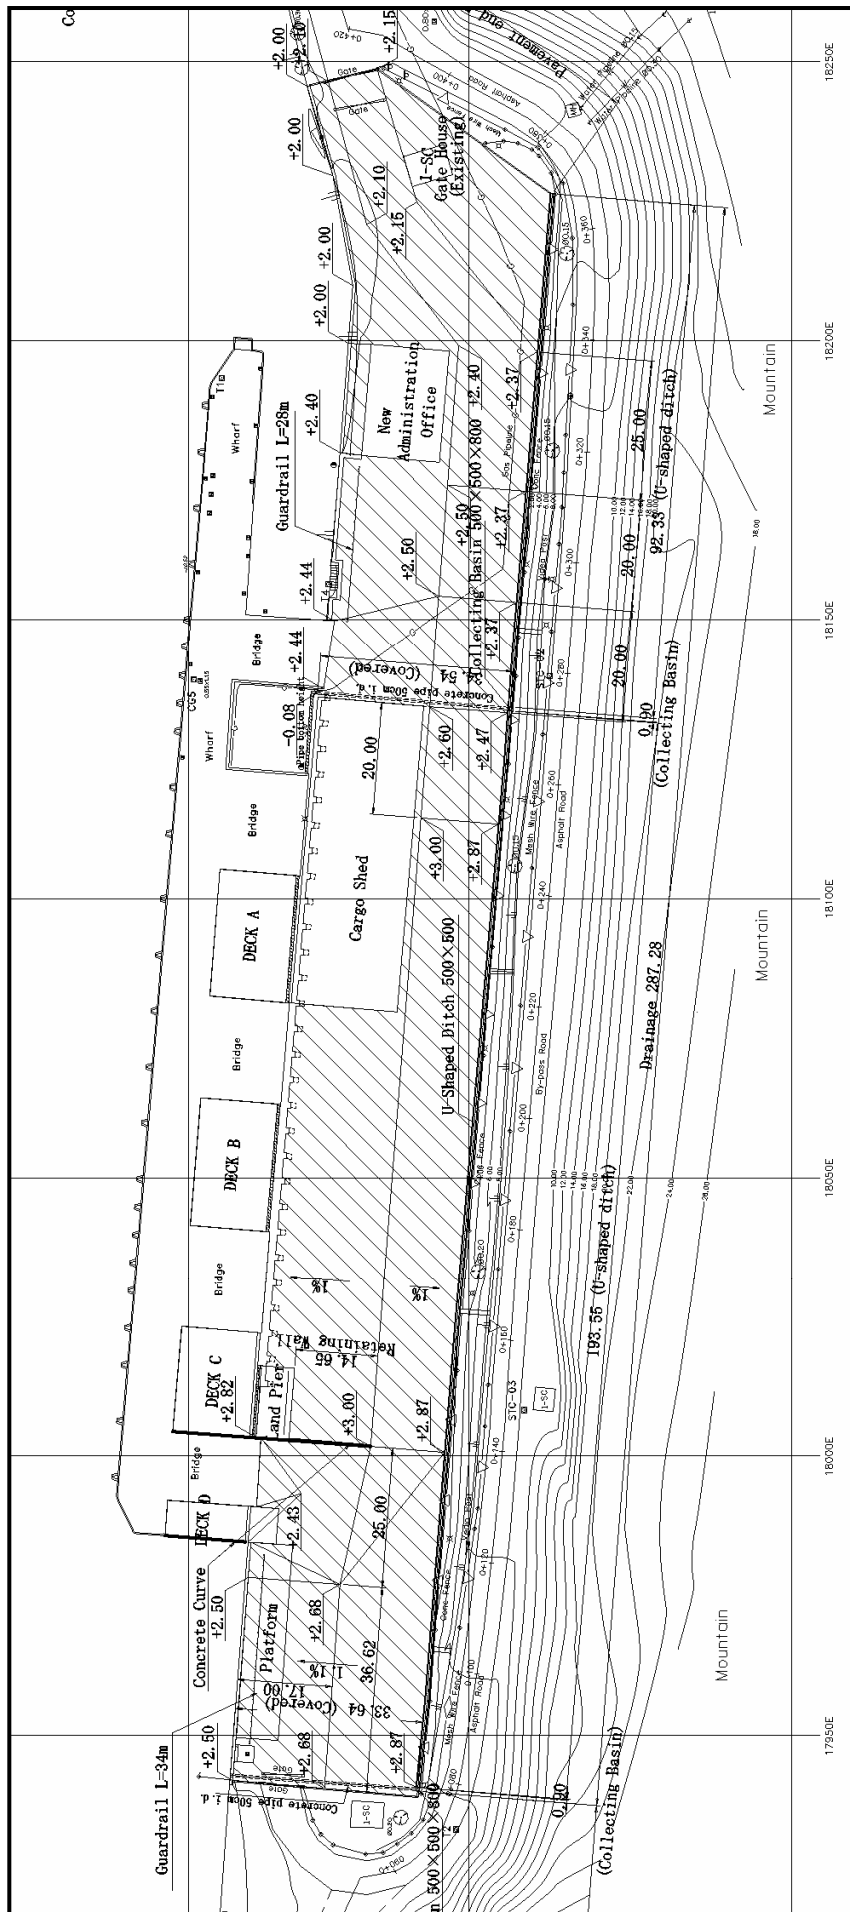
Floor plan of the pavement of the Cargo-Handling Area
